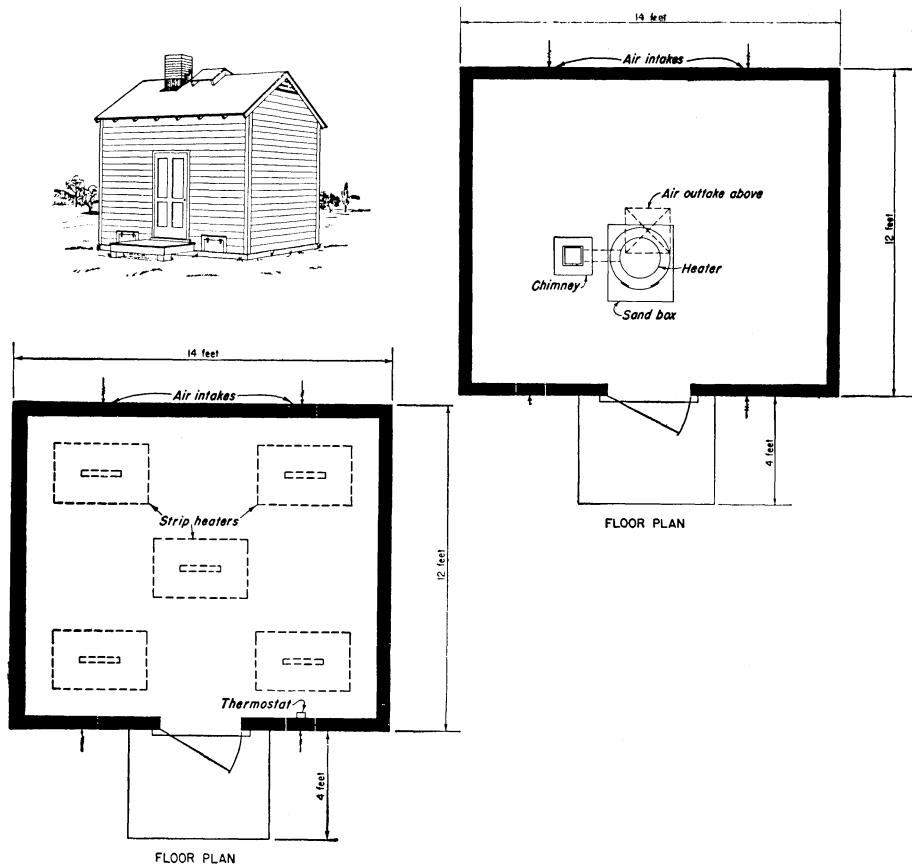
A 500-bushel sweetpotato storage house. (Exchange Plan No. 5649.) Above: Plan for stove heat. Lower left: Floor plan for electric heat.
